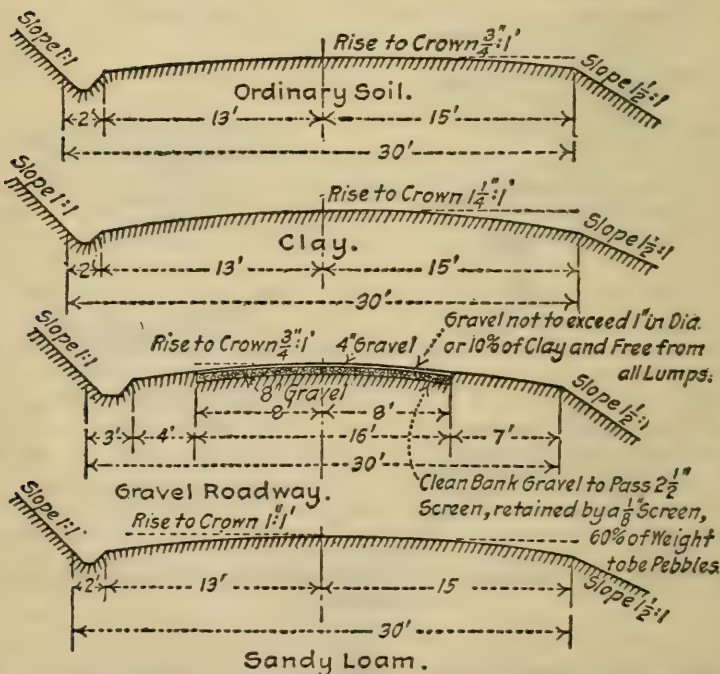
Typical earth and light gravel road sections, State of Pennsylvania.
